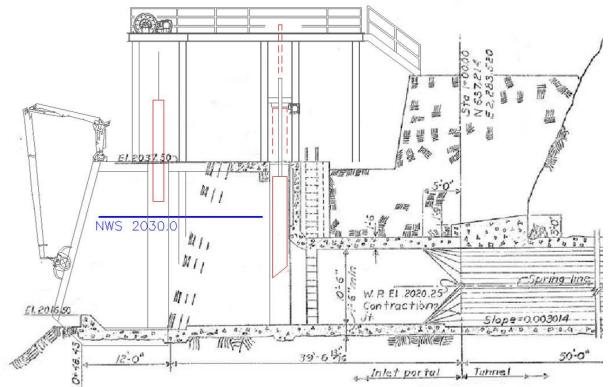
Conceptual level plan details of YCWA's proposed Lohman Ridge Inlet Control Gate and Debris Rake.
